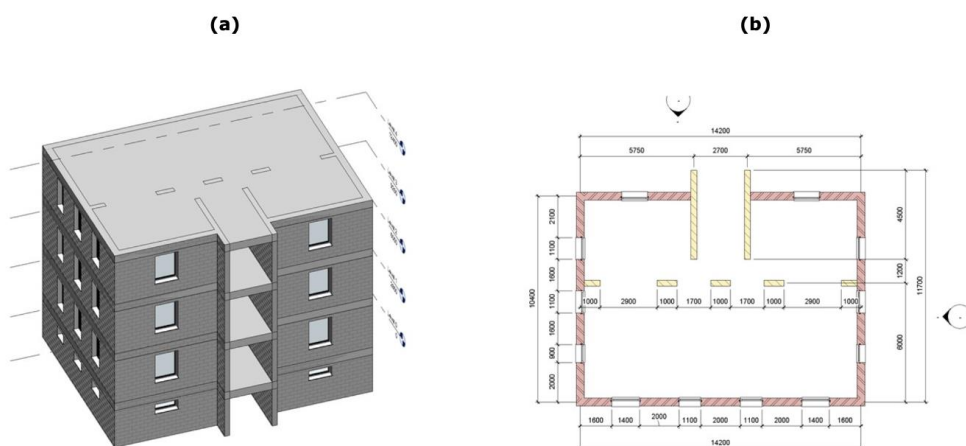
Render (left) and plan view (right) of the fictitious typical Swiss URM building.
